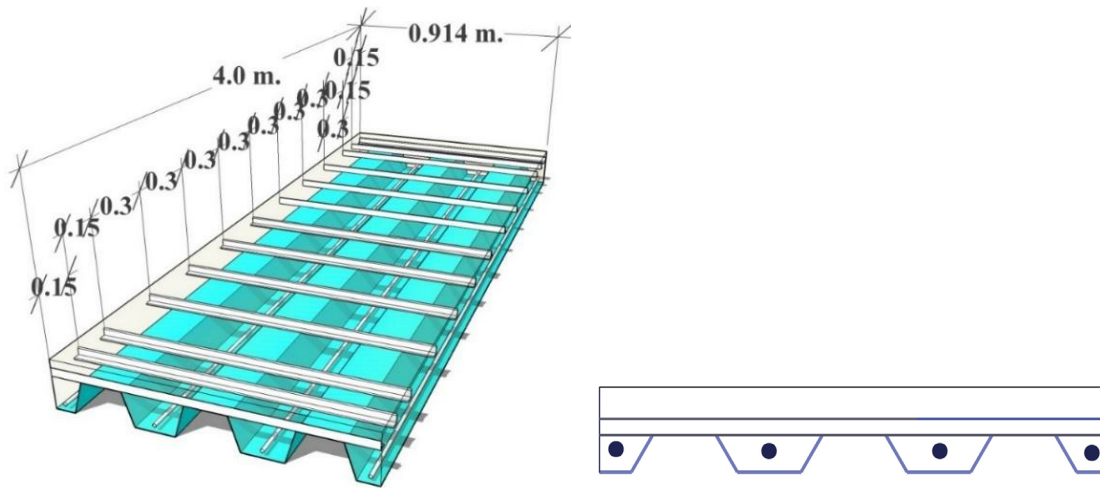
Details specimen SSR of test performed by (Na-Lampoon, 2016)
